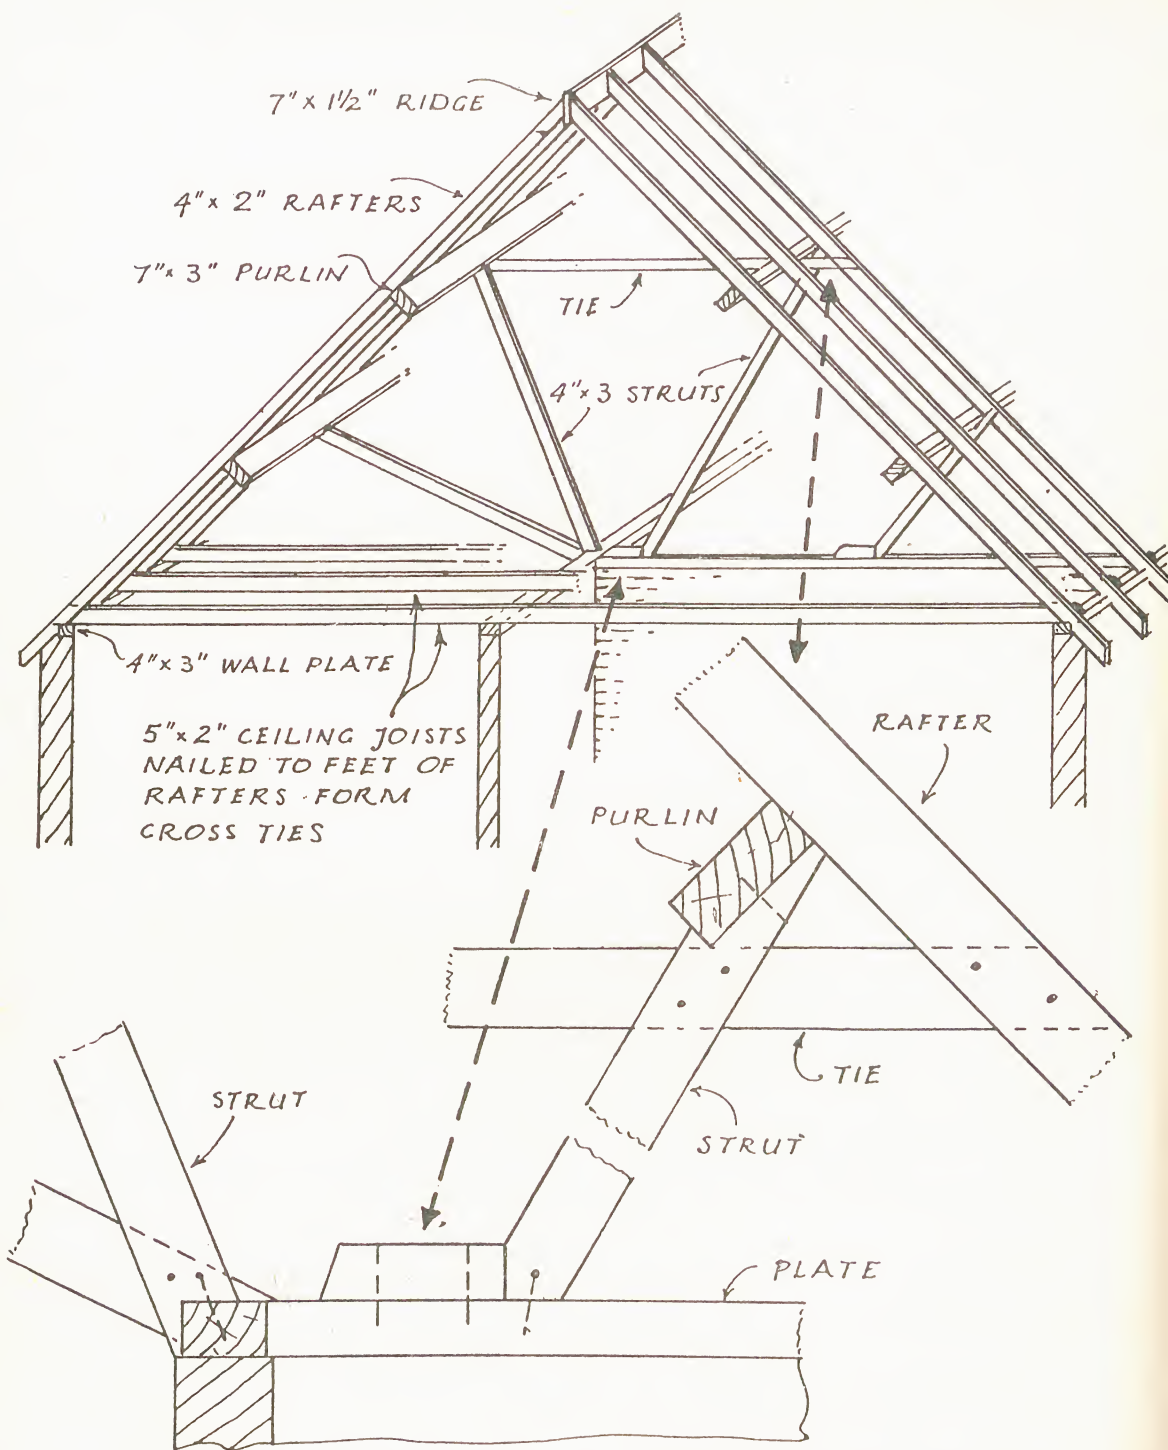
Typical house roof showing method of supporting purlins on struts. Alternatively, partition walls can be built up to support purlins.
